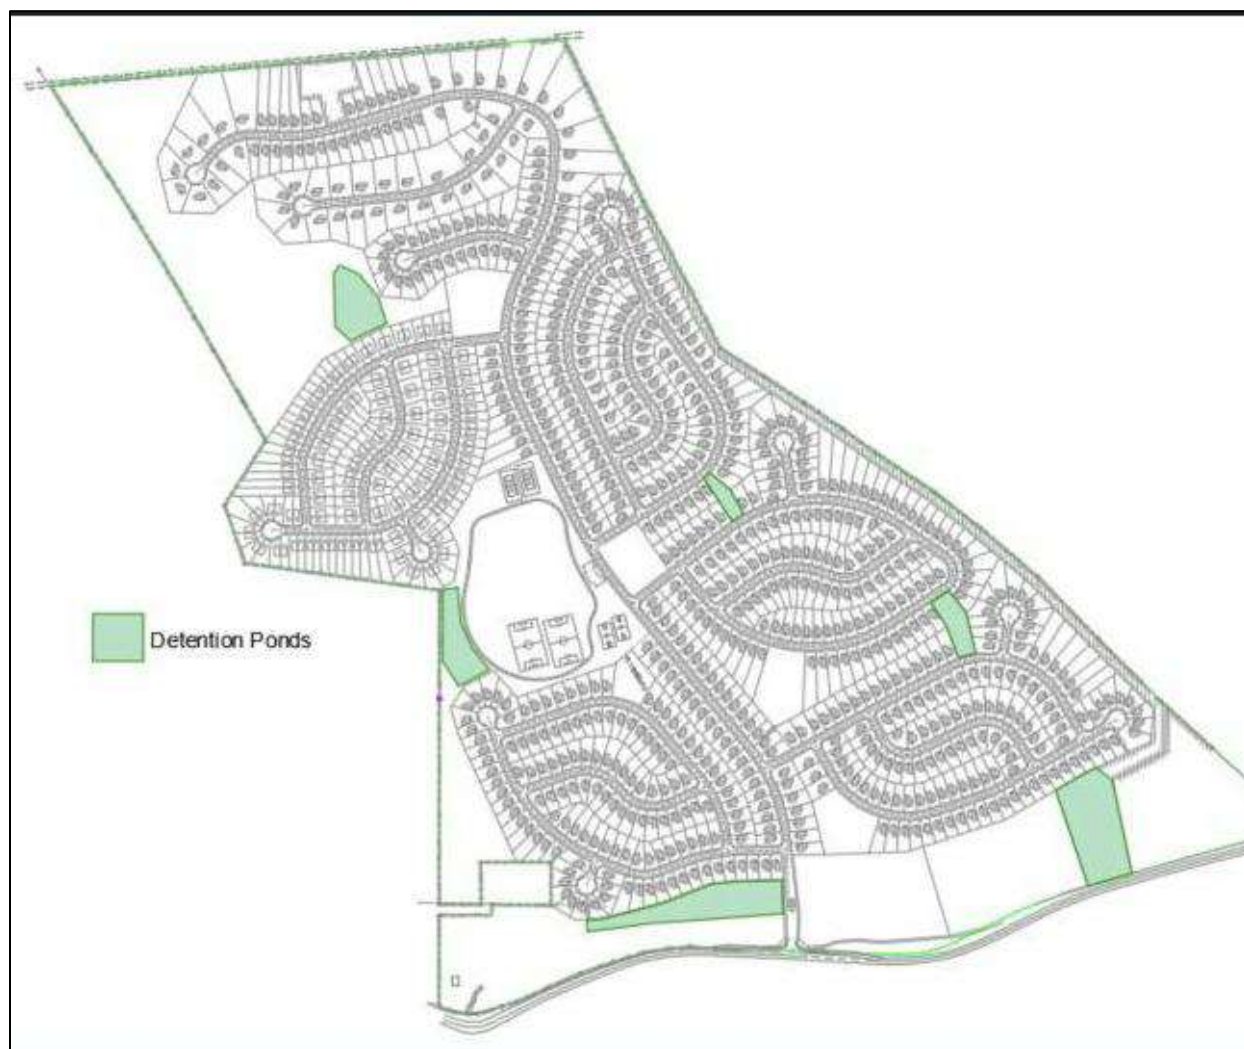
Proposed drainage system layout for the proposed Rozelle Estate
